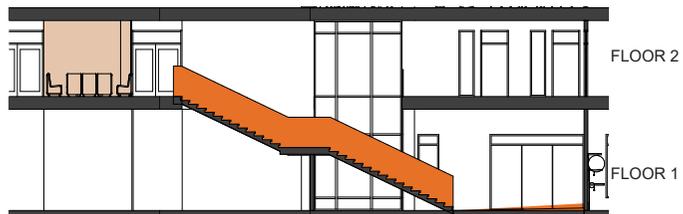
Illustration of a everyday staircase in connection to resting area and outside view
